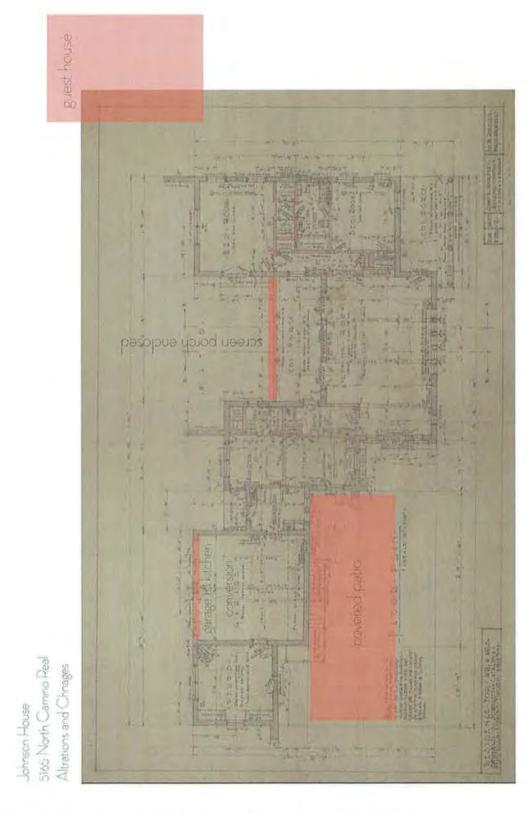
Alterations to the Johnson House superimposed on Joesler plans.
